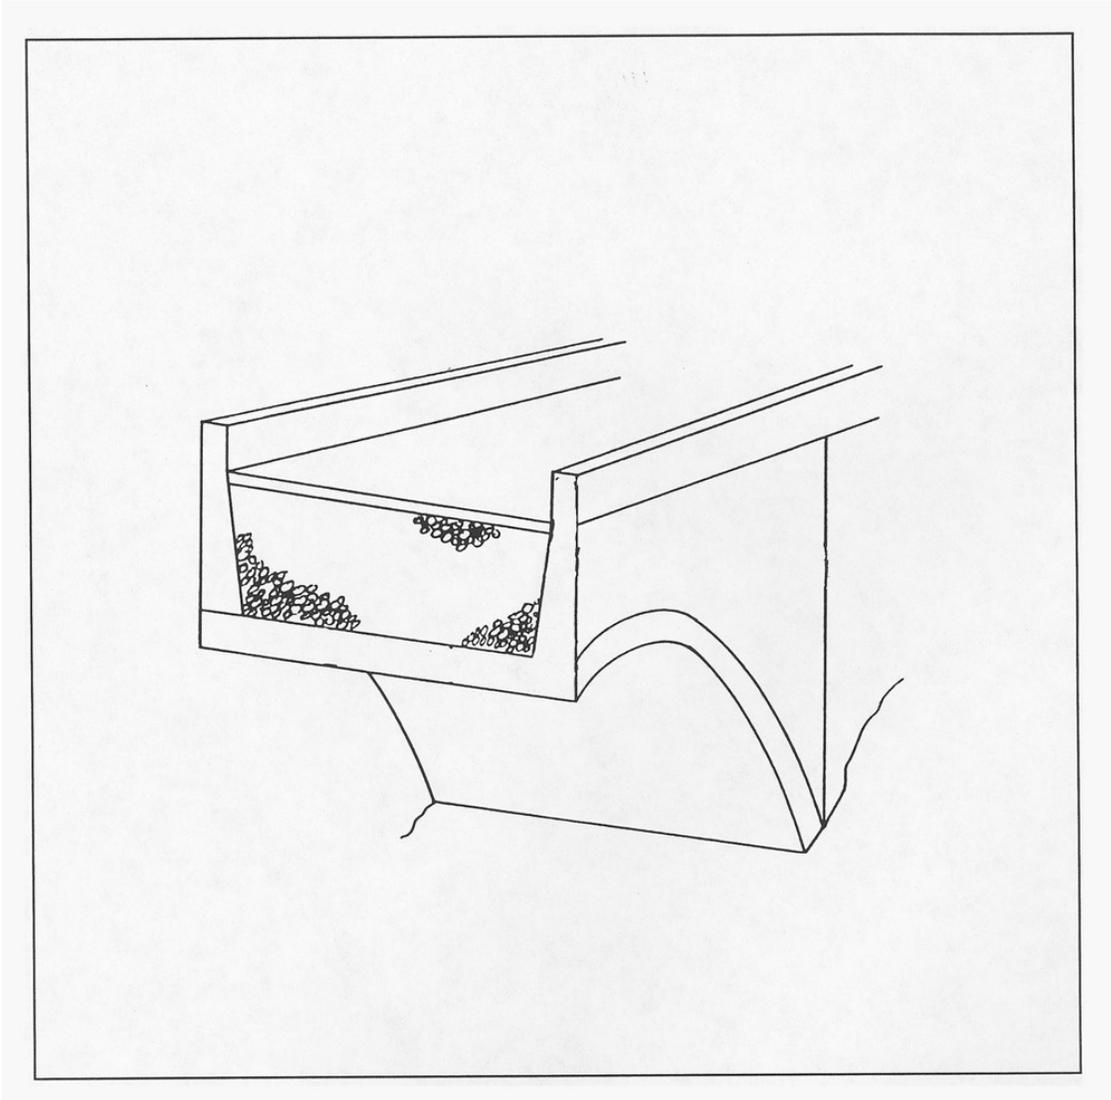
Section of closed spandrel concrete arch (Adapted from: FHWA 1991: 9-17).
